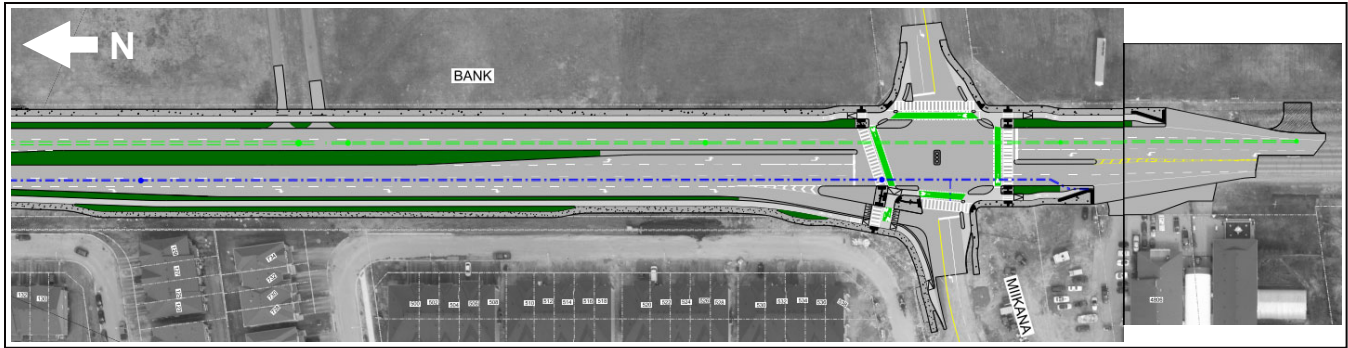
Bank Street Widening at Miikana Road/Blais Road
